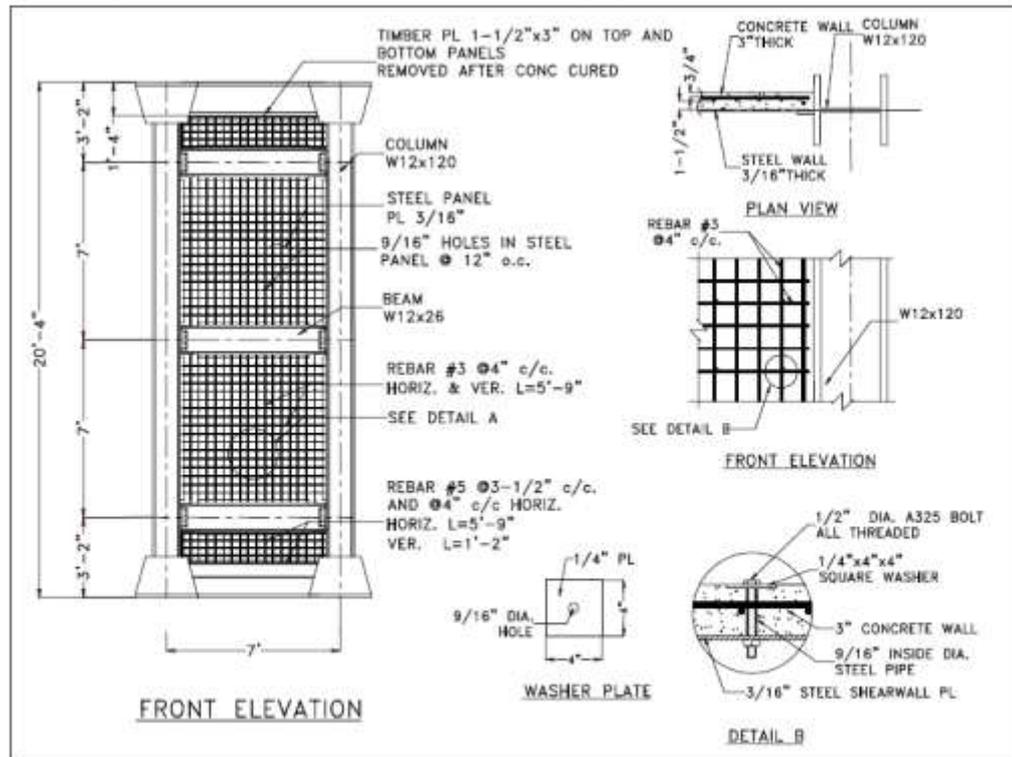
A Specimen with Details of Concrete Shear Wall [5]
